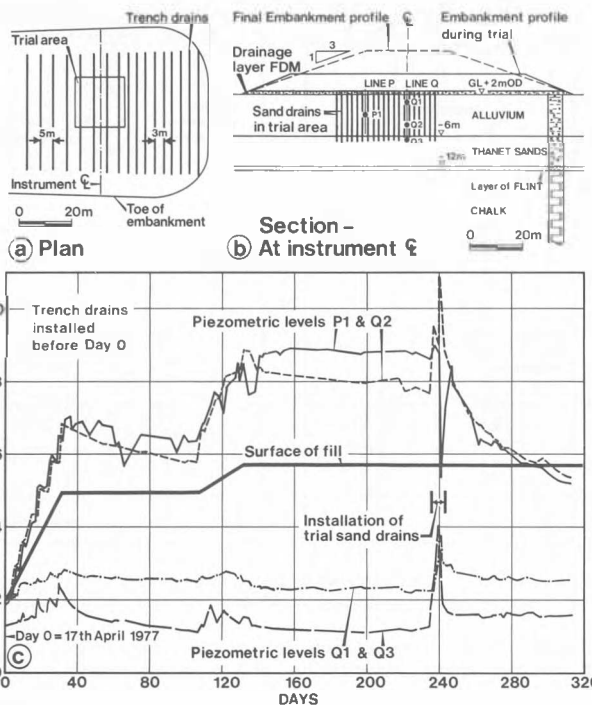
Sandwich By-Pass. a) Position of Trench Drains and Sand Drain Trial, b) Section, c) Results of measurements.
